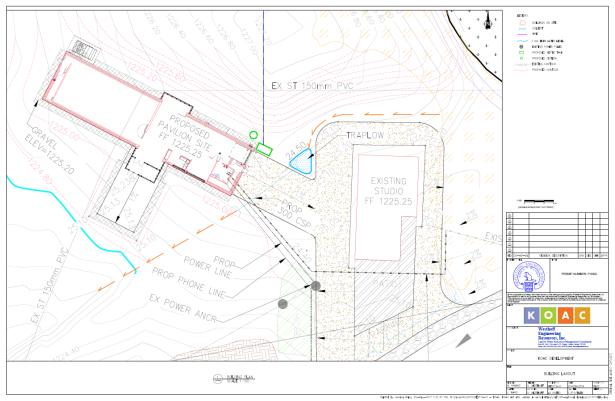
PROPOSED PAVILION (BUILDING LAYOUT)
